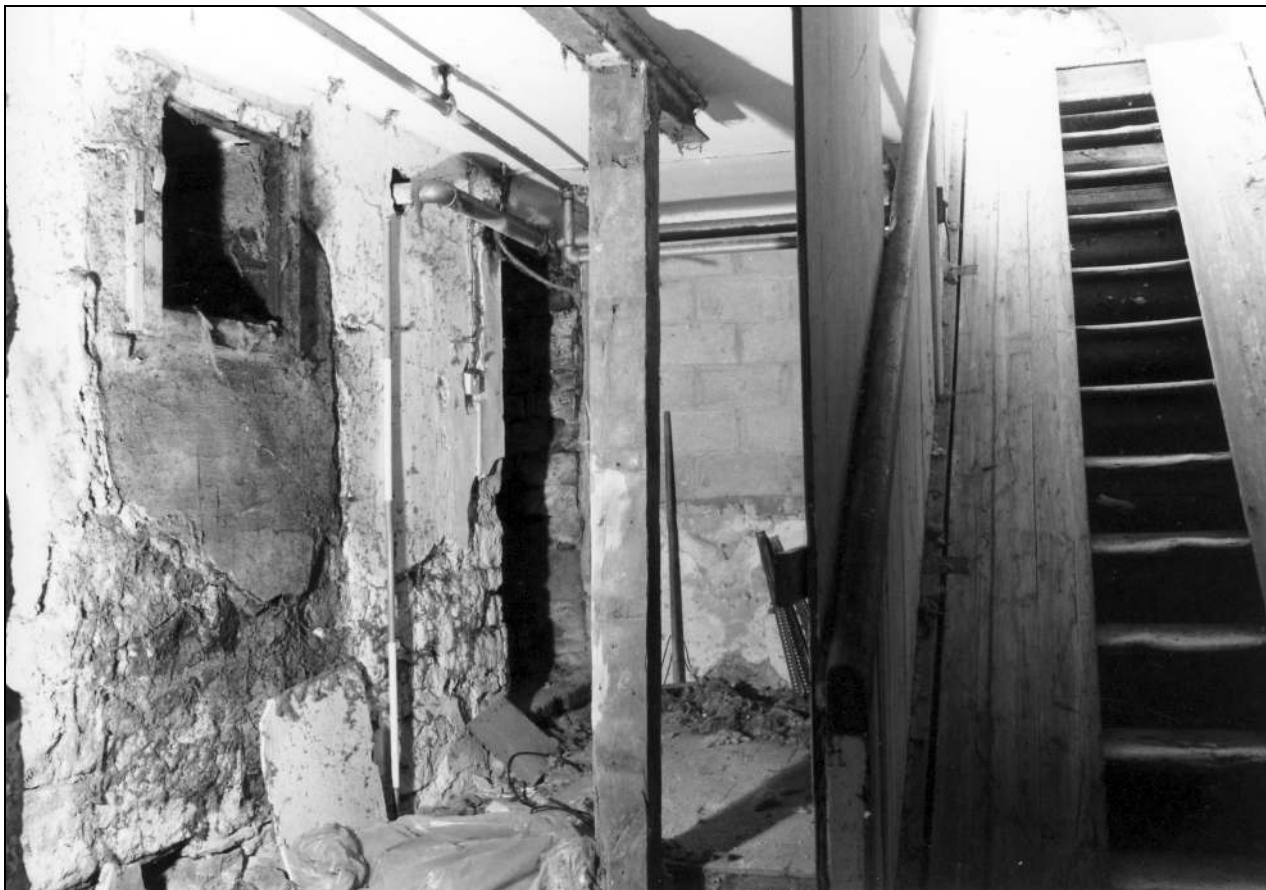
Ground floor of spinning mill, showing wall box and doorway to engine house, and stairs, from the south-east (film 6, frame 15)
